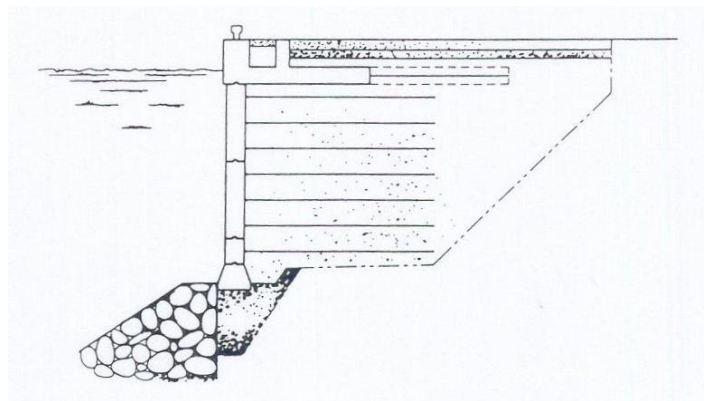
Geotextile reinforced retaining wall near the sea.
